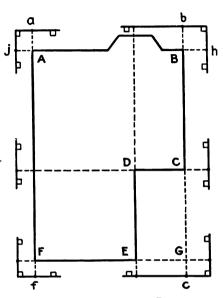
SETTING BATTER-BOARDS FOR A BUILDING.
